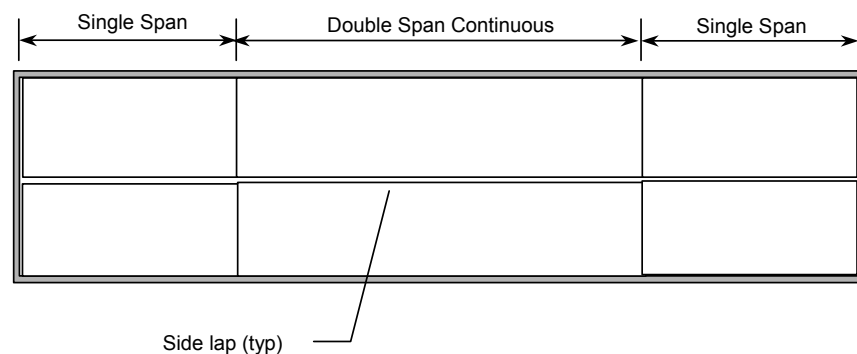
Plan layout of metal-deck panels in Diaphragm #2
